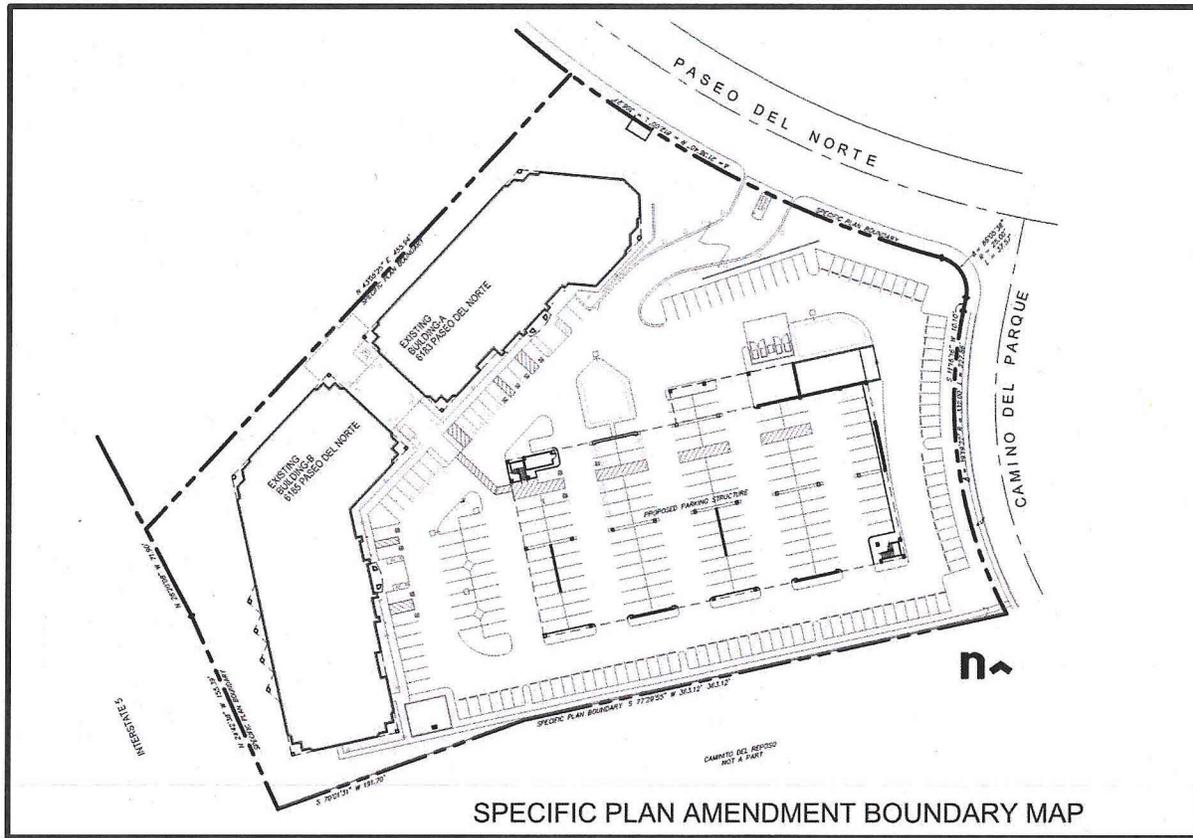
LAND USE PLAN – CARLSBAD CORPORATE PLAZA SPECIFIC PLAN
